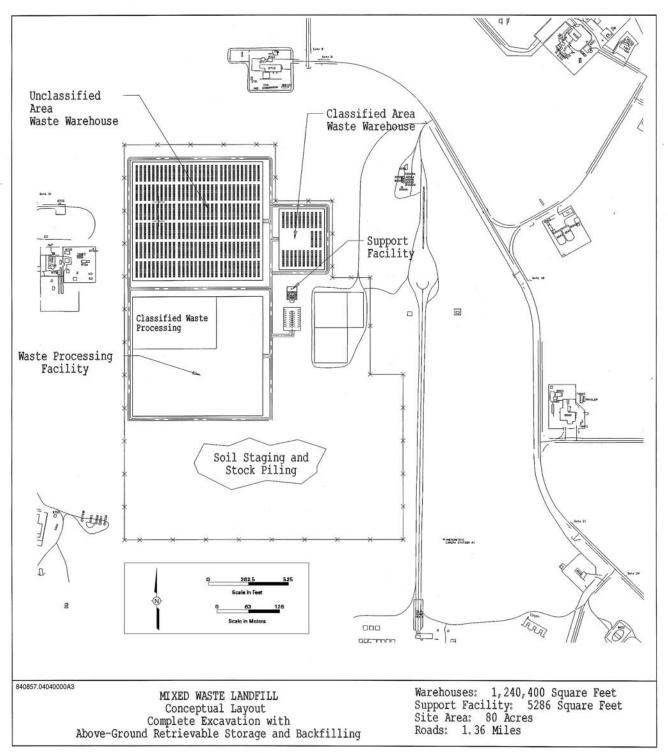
Complete Excavation with Aboveground Retrievable Storage and Backfilling
